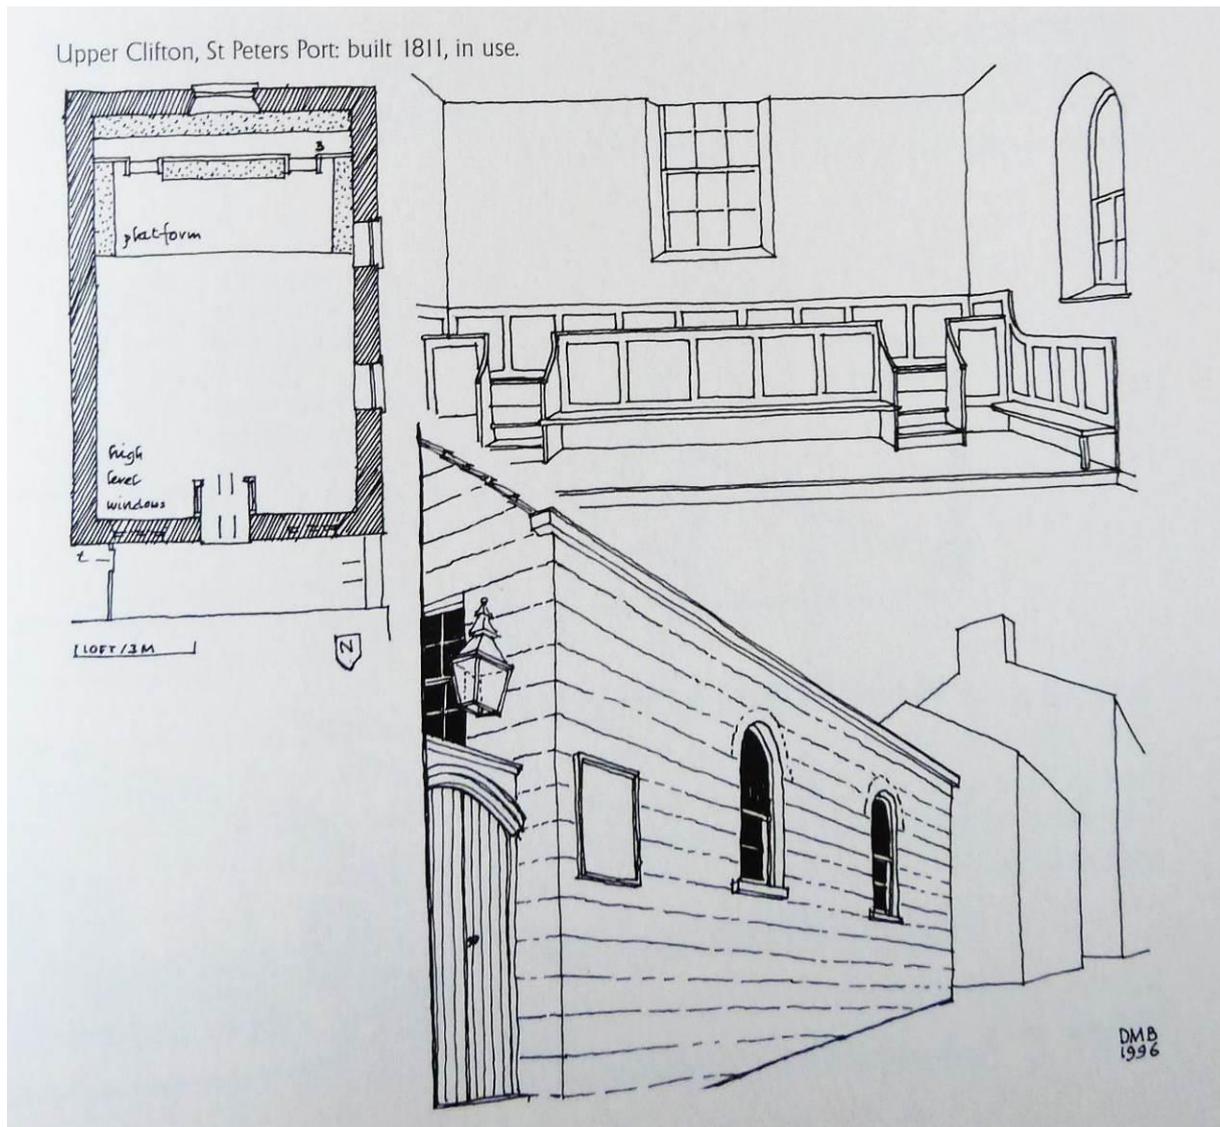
Plan, internal view and external perspective of the meeting house in Guernsey. (North is at the bottom of the plan; not to scale.) (Butler, vol. 1, p. 233)
